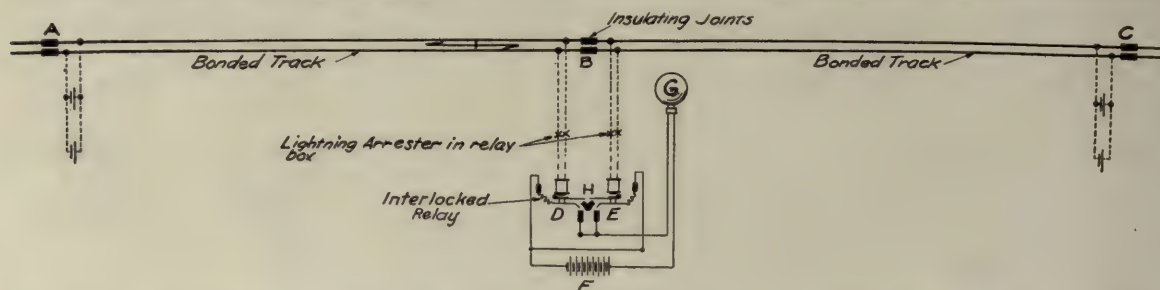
Arrangement for Single Track Highway Crossing Bell. The Union Switch & Signal Company.
